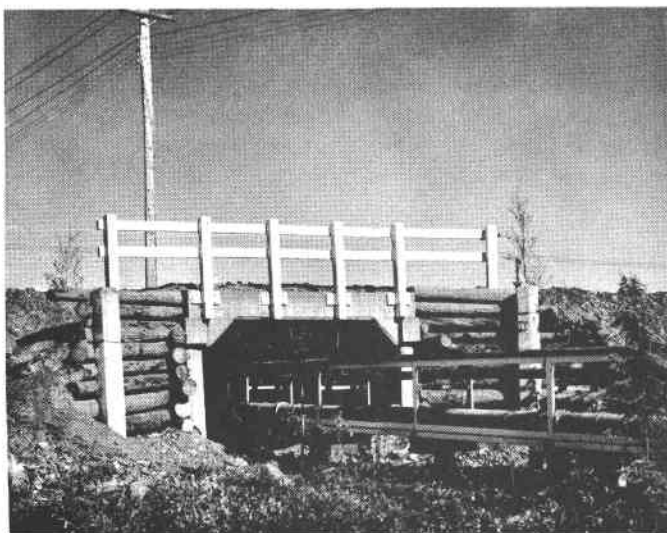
Concrete and wood piling for bridge and utilidor foundations
